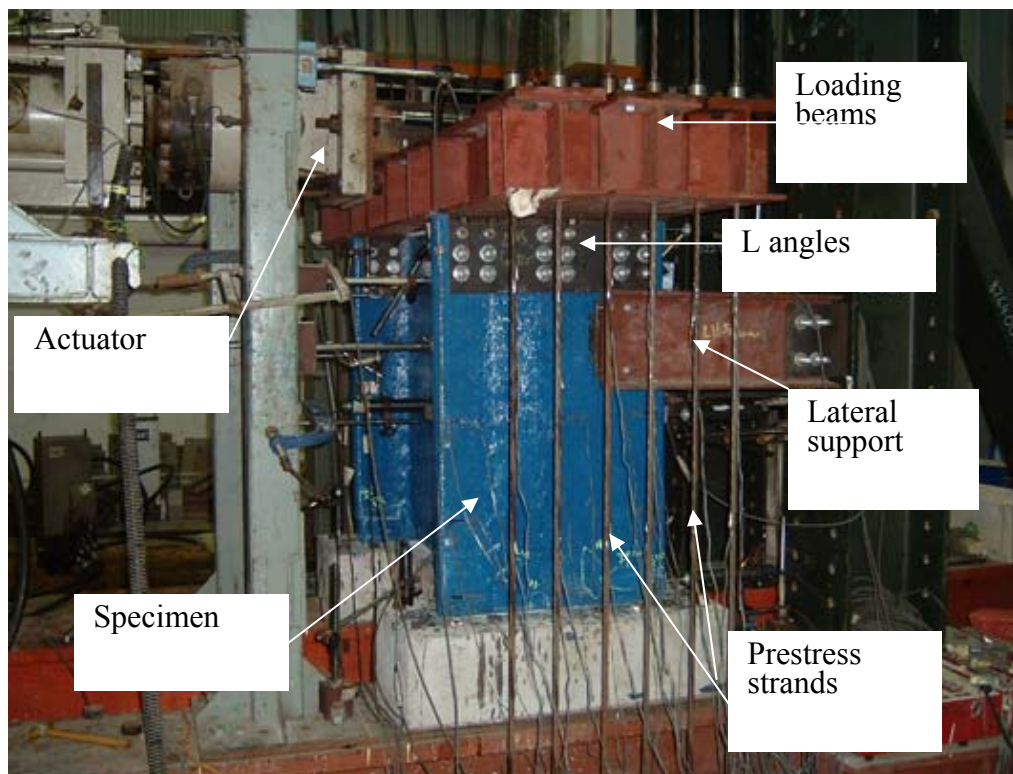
3D view of test setup for FRP wrapped wall (specimen S2)
